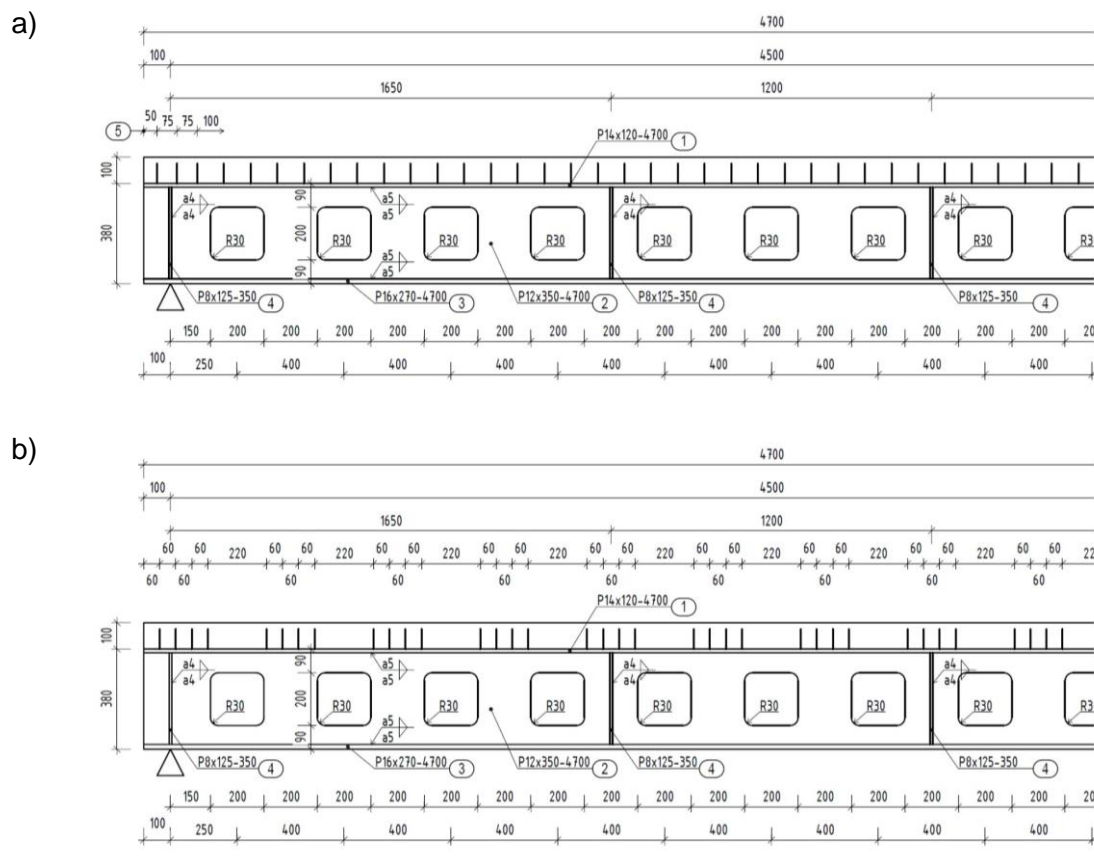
Side view of the beam samples differing in shear connectors' layout – a) uniform and b) non-uniform.
